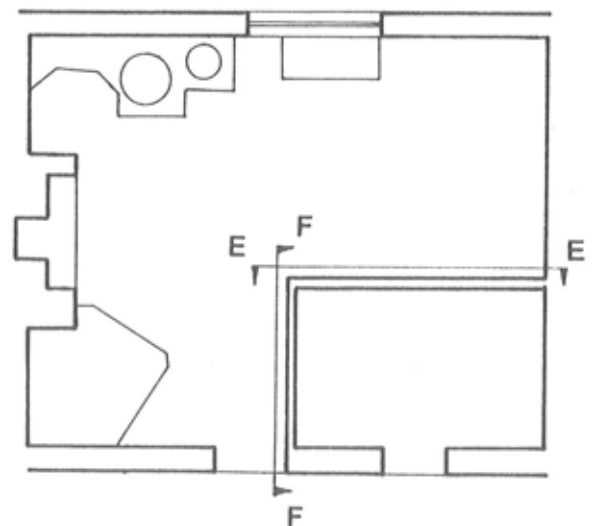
Farmhouse kitchen elevations, (1:20 at A3)
